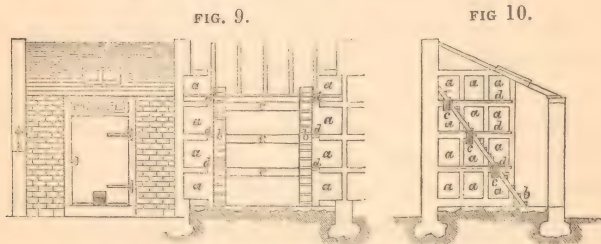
Front elevation and longitudinal section of poultry-house.
